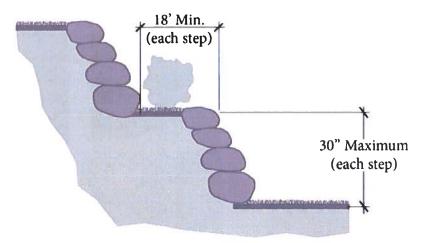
c. Allowable terrace configuration for wall or rockery adjacent to a public sidewalk. Note that this illustration shows a stone wall, but other masonry and concrete walls are acceptable as well.
